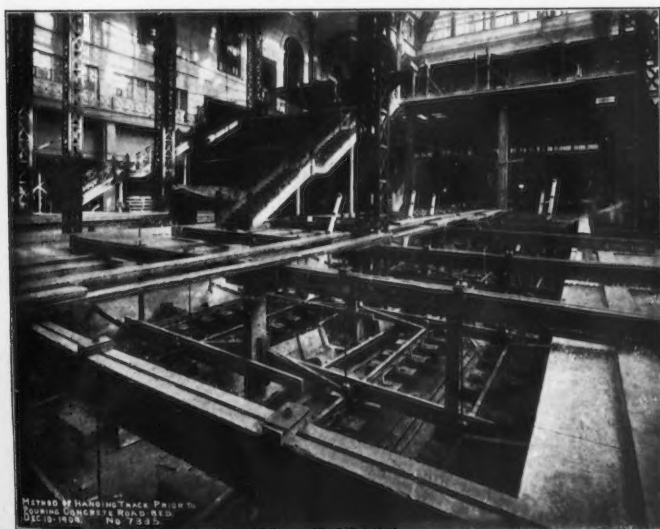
METHOD OF SUPPORTING TRACK STRUCTURE TO RECEIVE CONCRETE BASE.
